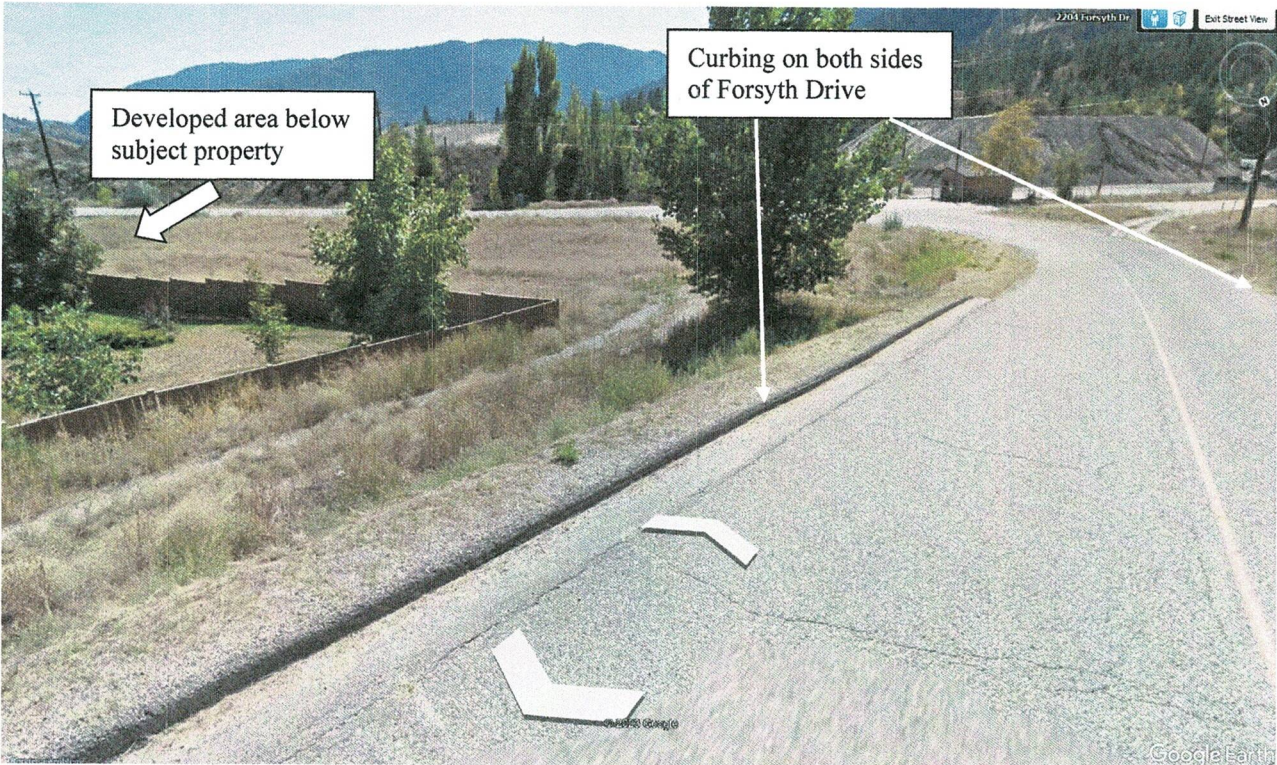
(Google Earth): Street view looking southwest down Forsyth Drive
